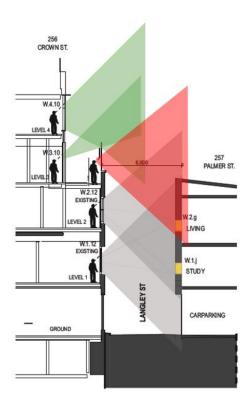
Edited extract of privacy analysis which demonstrates overlooking from the proposed Level 3 terrace (red cone) to No. 257 Palmer Street
